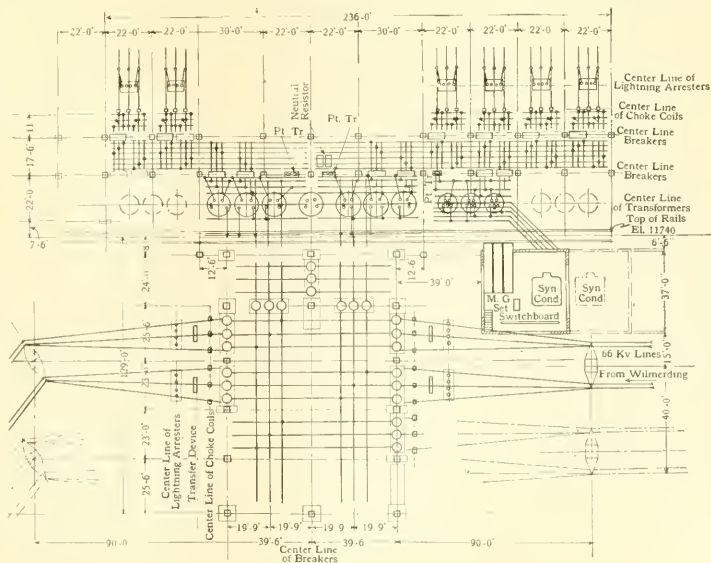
DIAGRAMMATIC PLAN OF DRAVOSBURG SUBSTATION
